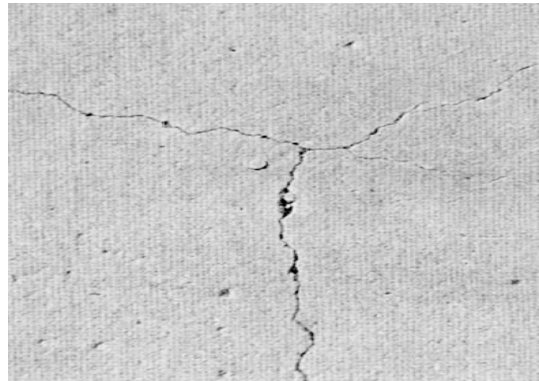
Drying Shrinkage Cracks due to Improper Joint Spacing.
